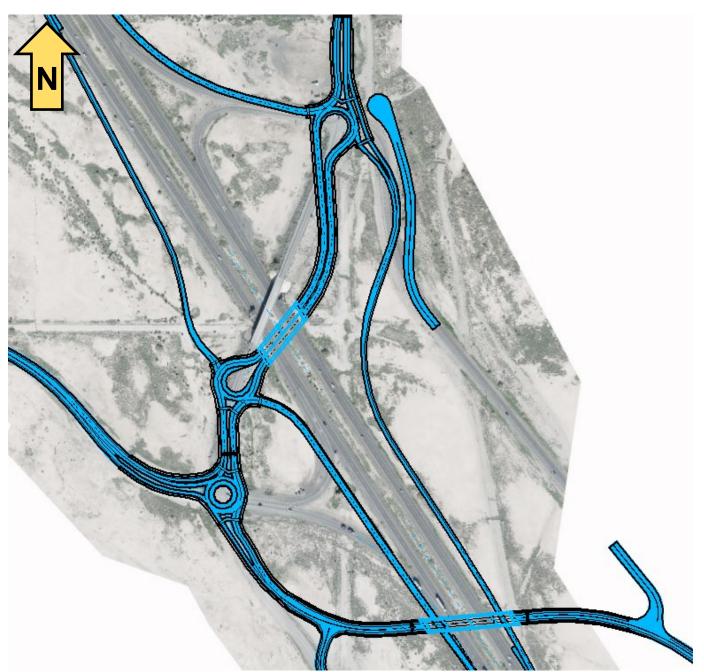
SR 587/Casa Blanca Road recommended build alternative
